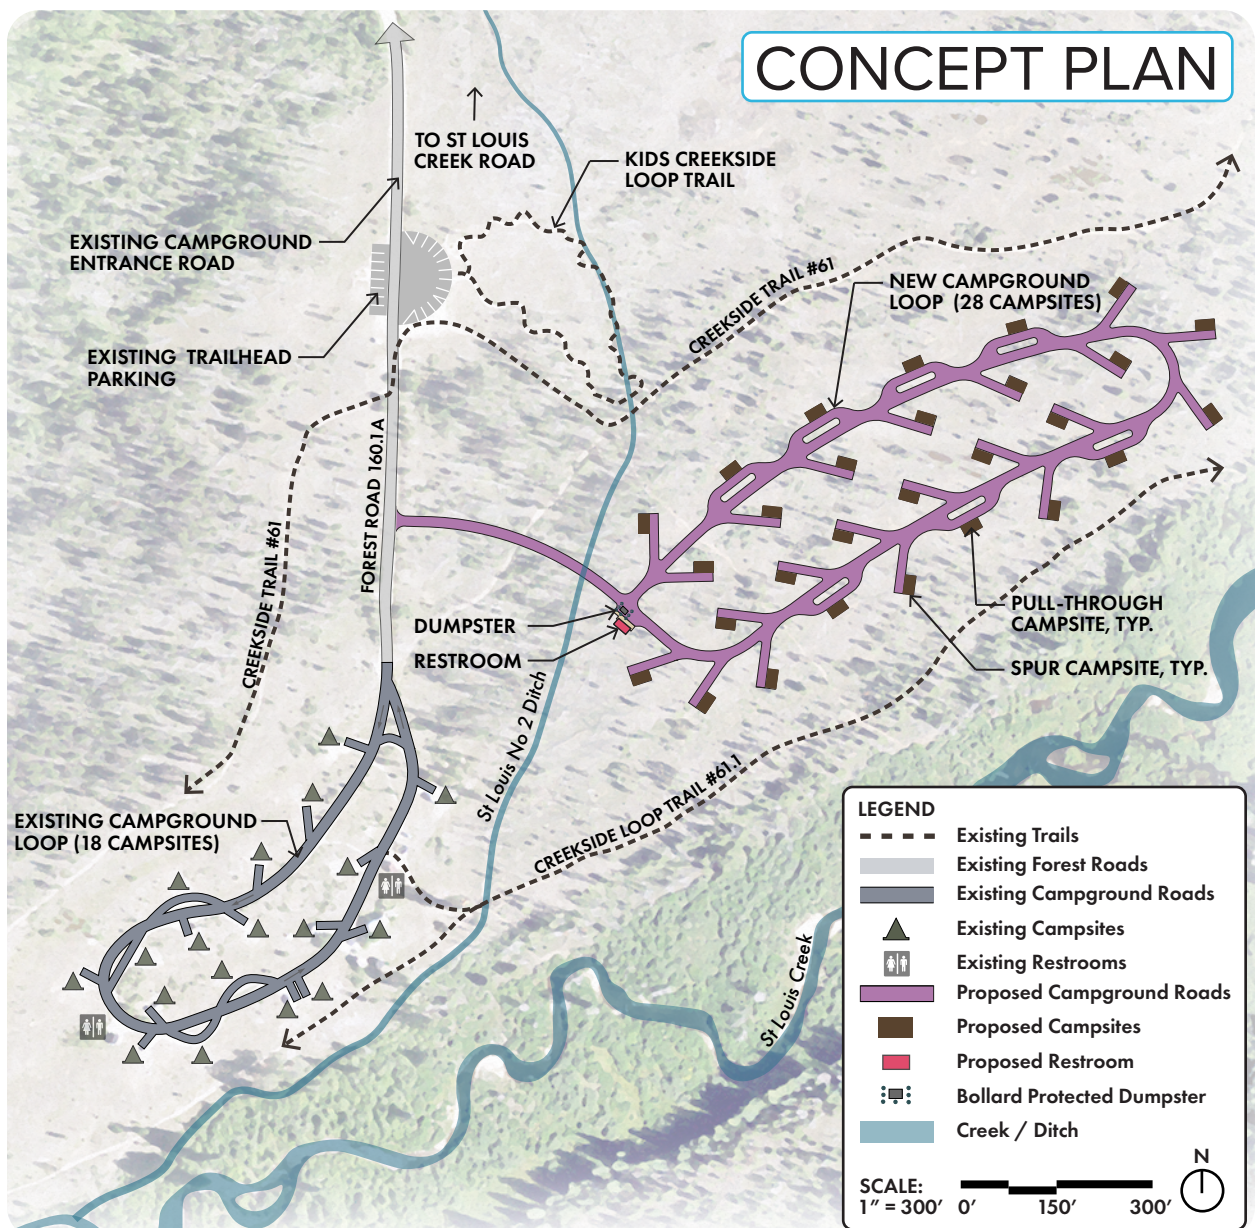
Concept plan for campground loop expansion at St. Louis Creek Campground.
